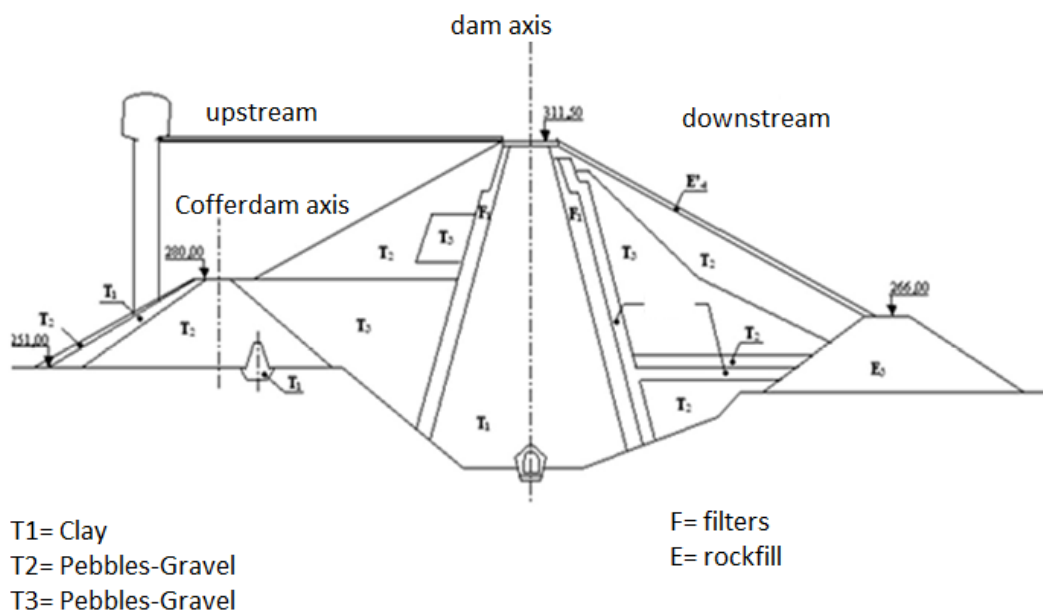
Typical cross-section of the dam (Smail, 2014)
